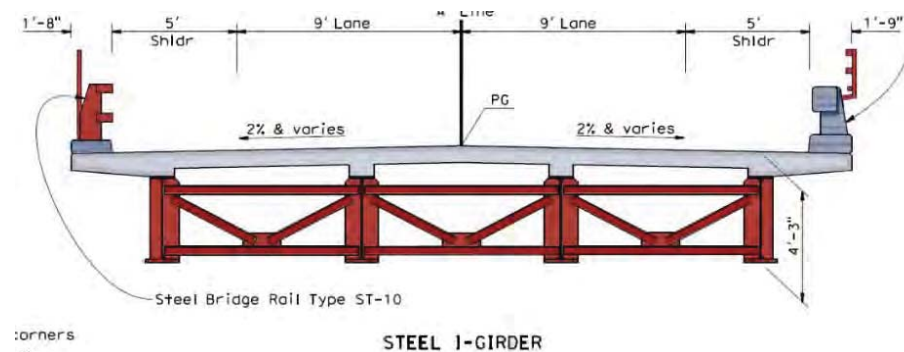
Long Span Prefabricated Steel Plate Girder Bridge Design Cross-Section
